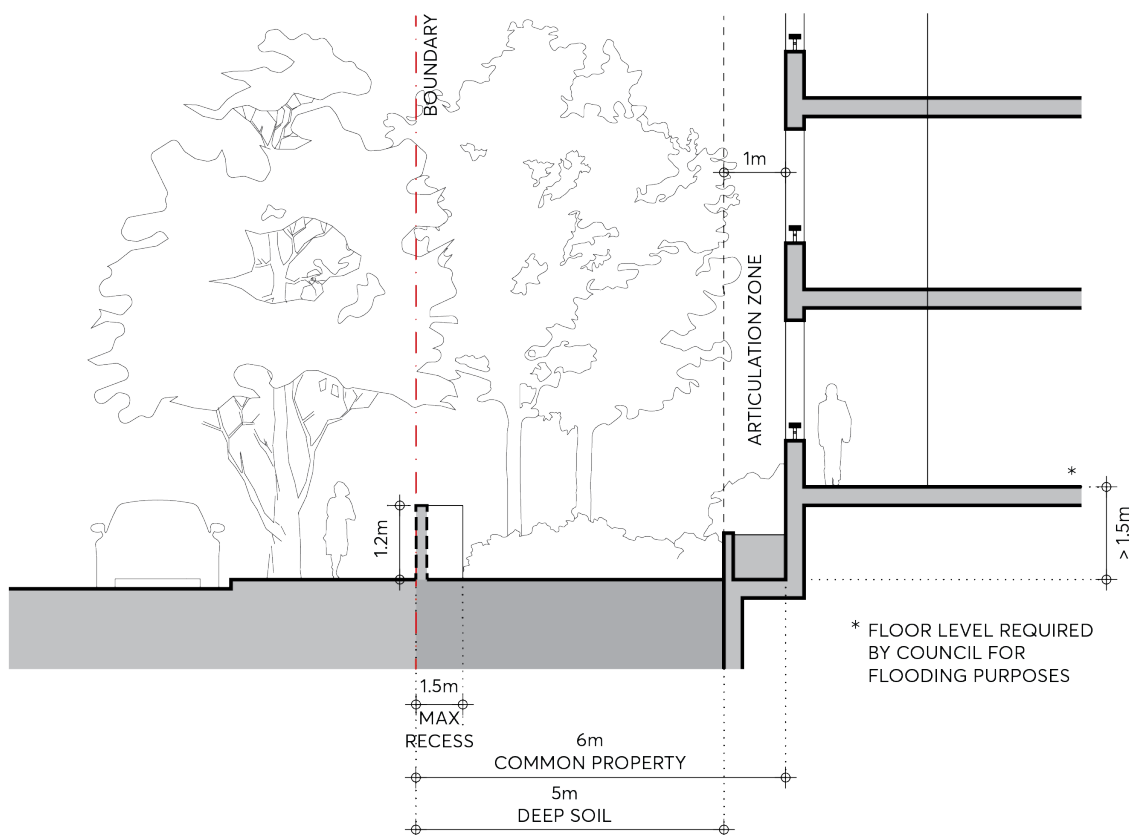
Residential Ground Floor: Floor level required greater than 1.5 metres above footpath level
